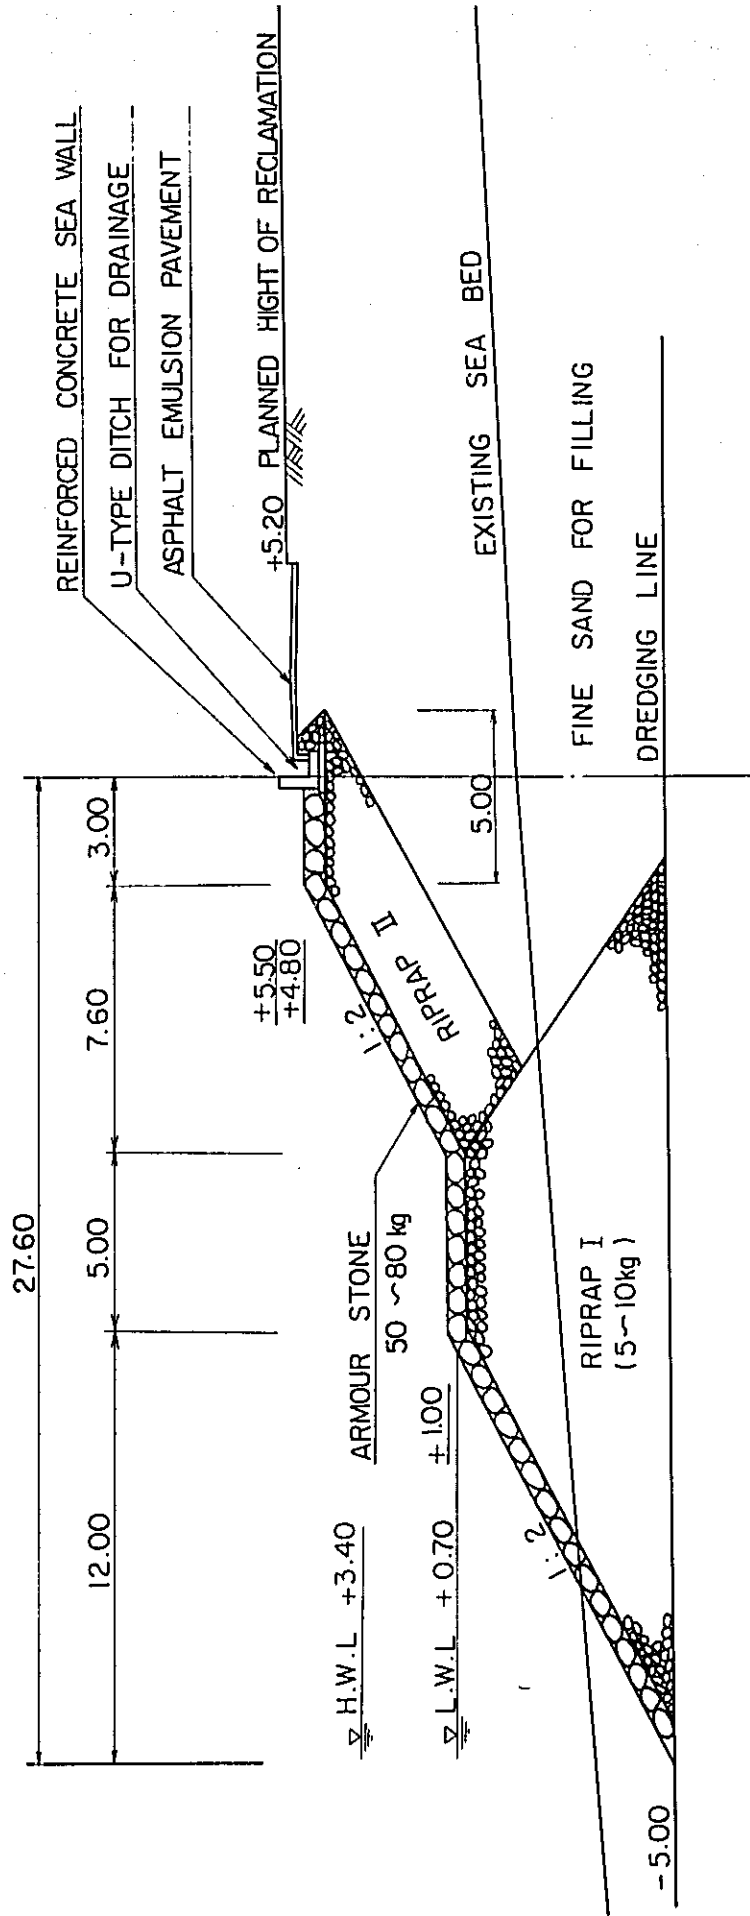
TYPICAL CROSS SECTION OF EMBANKMENT
